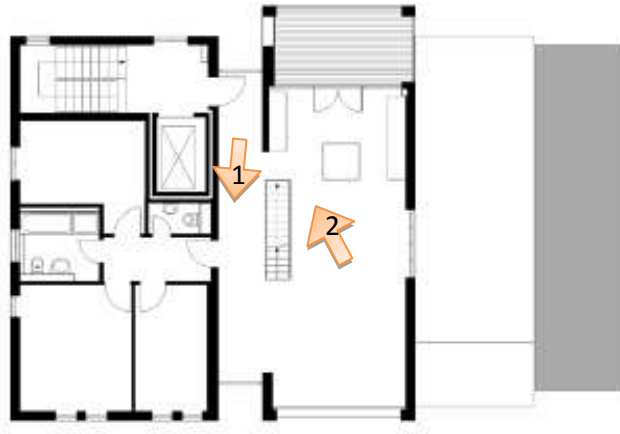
Architectural plan of residential unit of the upper floor of the building (Source: Schuster, 2005)
